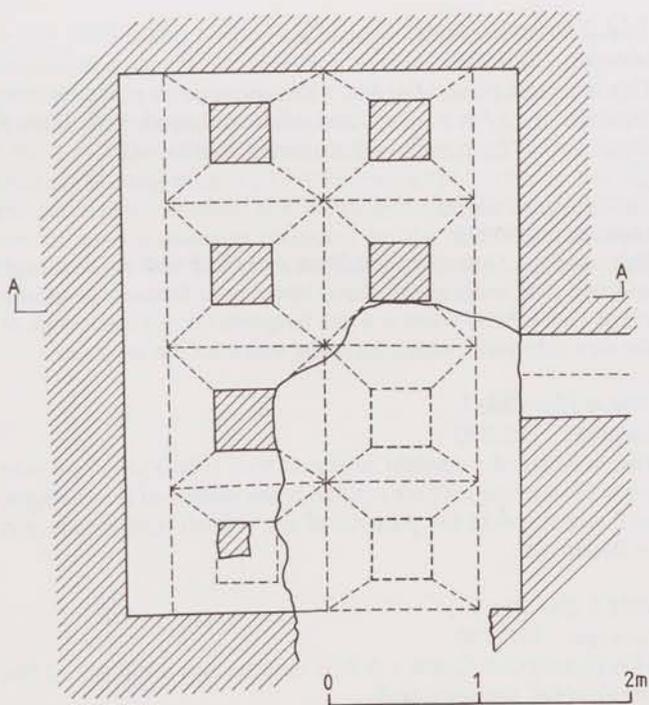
Nazareth (No. 103). Bath house. Hypocaust plan.
